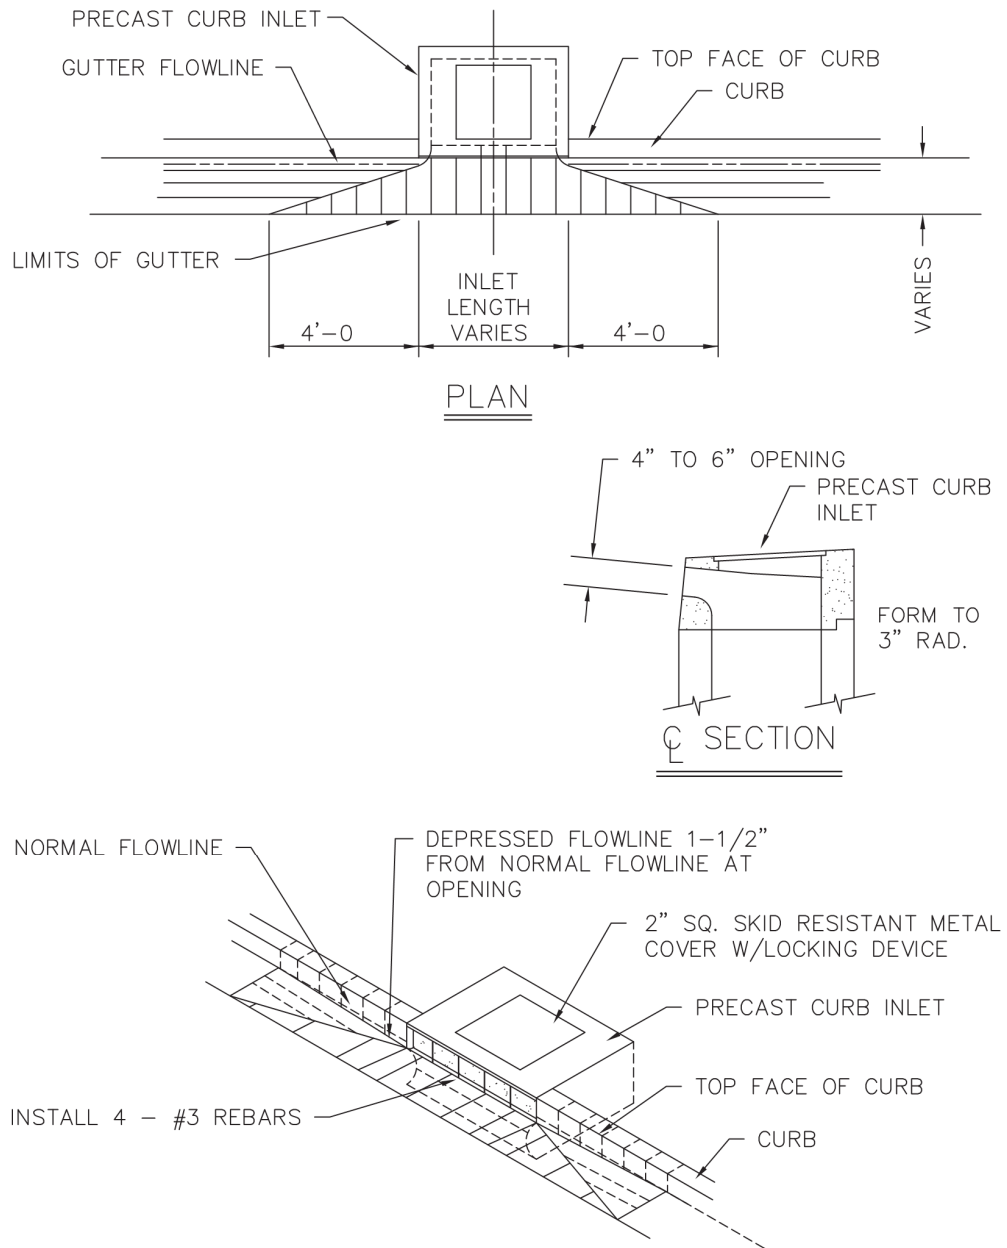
A standard detail with a plan, section, and pictorial view of a storm sewer drain inlet.
